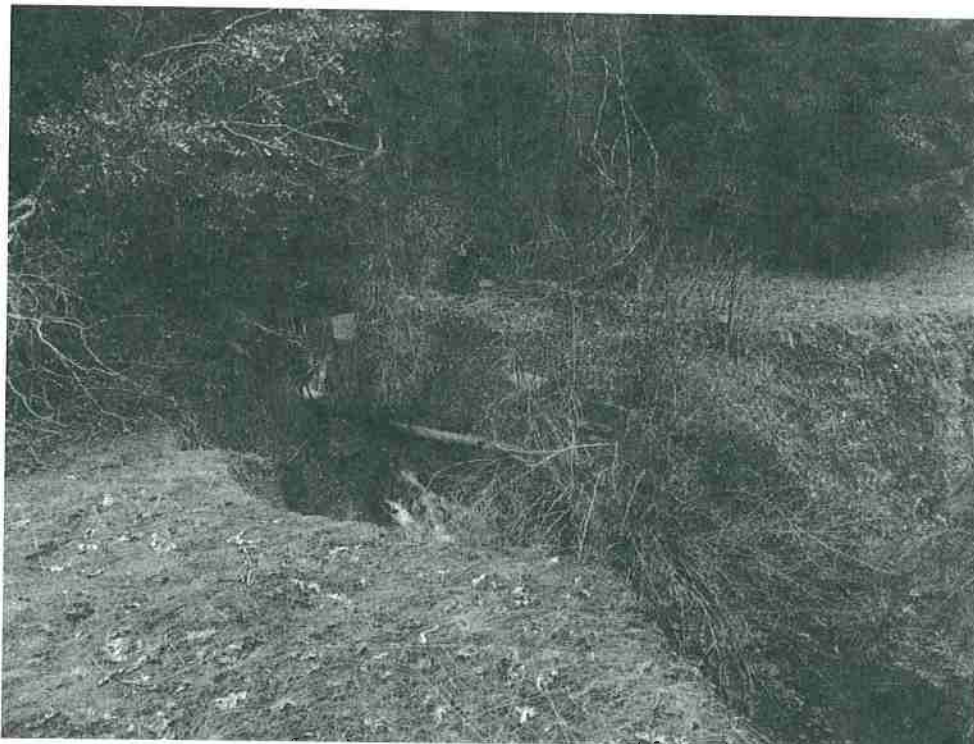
, MP #5 – SC #2- View of a Class II watercourse that has washed out the crossing with an old culvert and pipe still remaining in the road fill.
